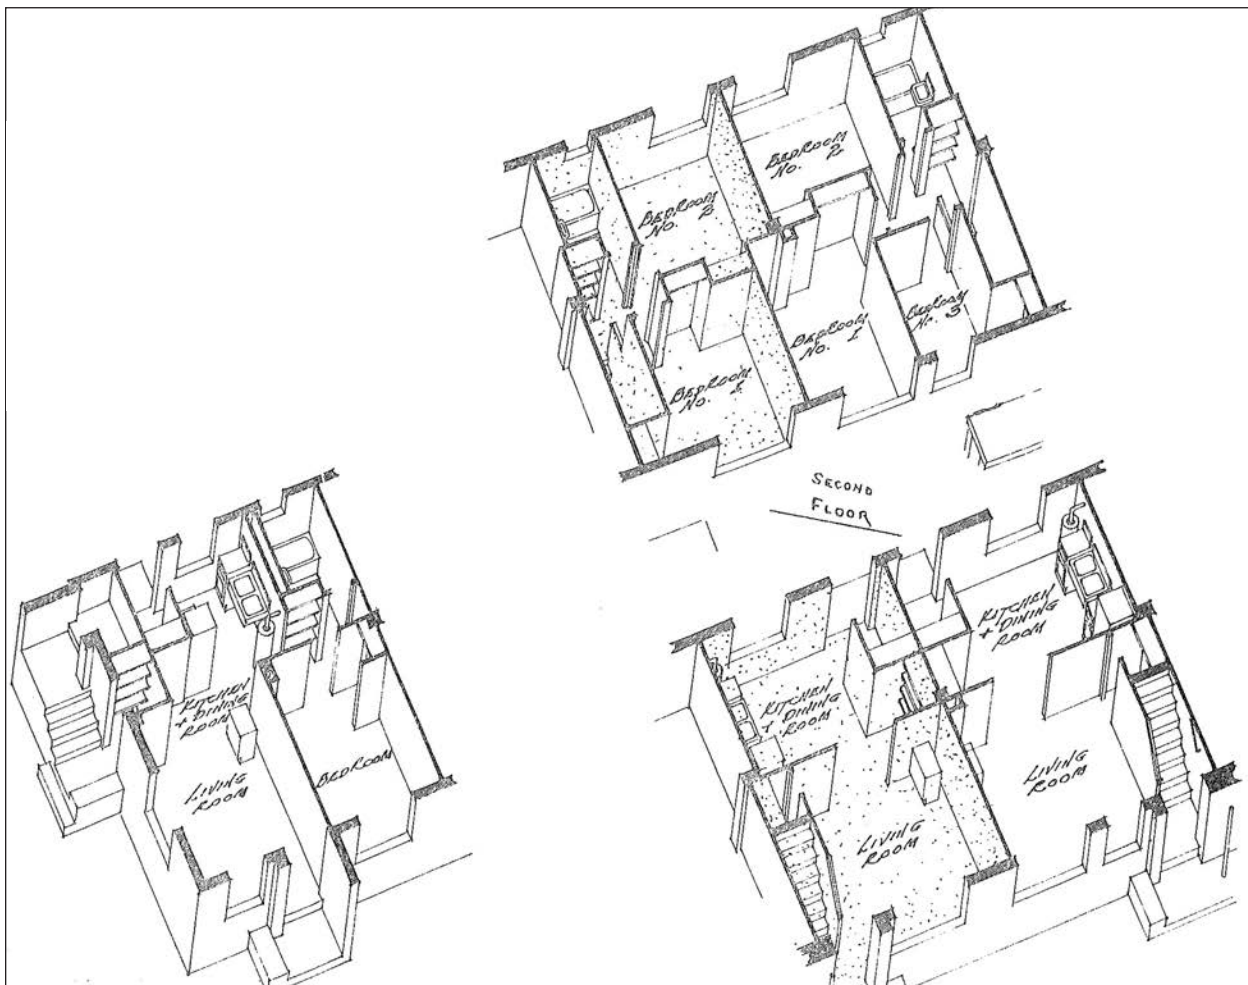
These original floor plan sketches show the plan for the three types of apartments. On the lower left is the one bedroom unit, located on a single floor. On the right are plans of the first and second floors of the larger apartments. The apartment shaded with dots is the two bedroom unit and the other is the three bedroom unit. Courtesy of Macon Housing Authority Archives.
